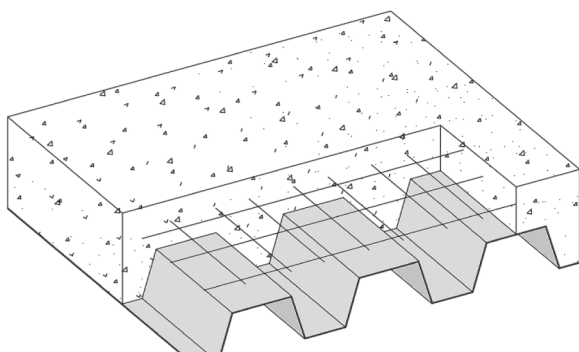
Typical steel-concrete slab with trapezoidal metal deck.
